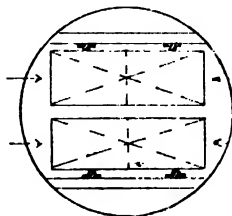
Usual Arrangement of Rail Guides. The arrows show where the tubs enter the cage
